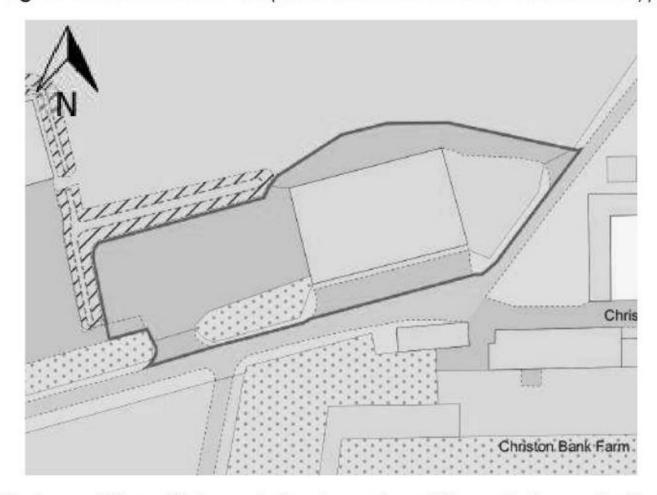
Site Layout Plan with boundaries shown in red (boundaries are indicative only)
